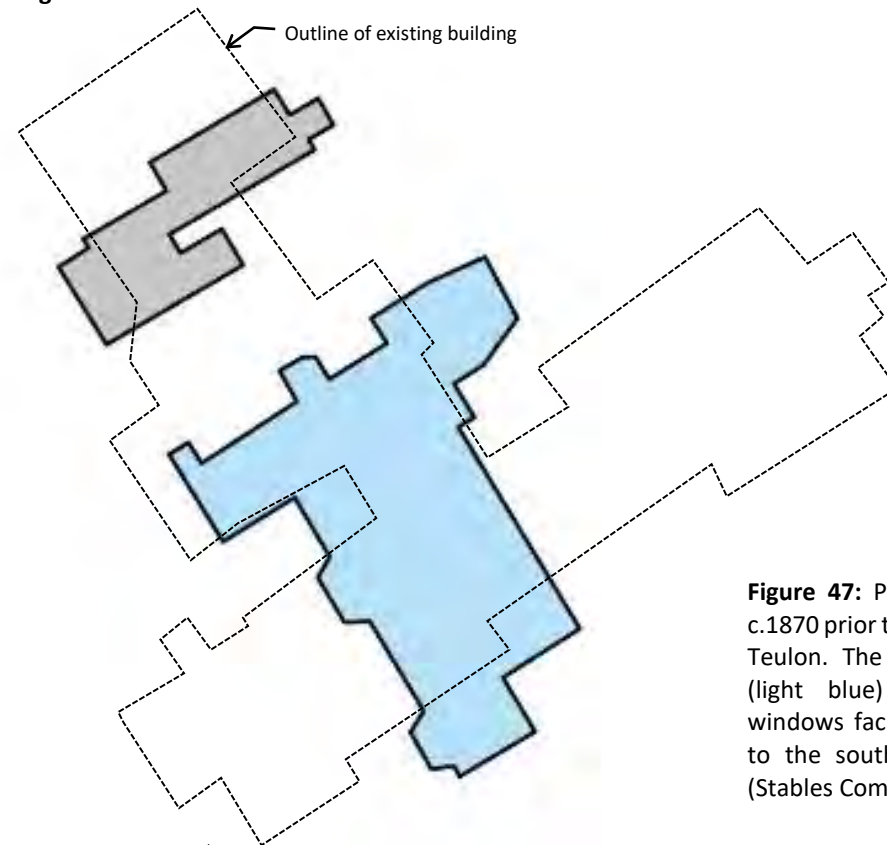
Plan of the house prior to c.1870 prior to works undertaken by S.S. Teulon. The 'T' shaped 18th C house (light blue) had two canted bay windows facing west, an offset corner to the southeast and an outbuilding (Stables Complex) (indigo) to the north.
